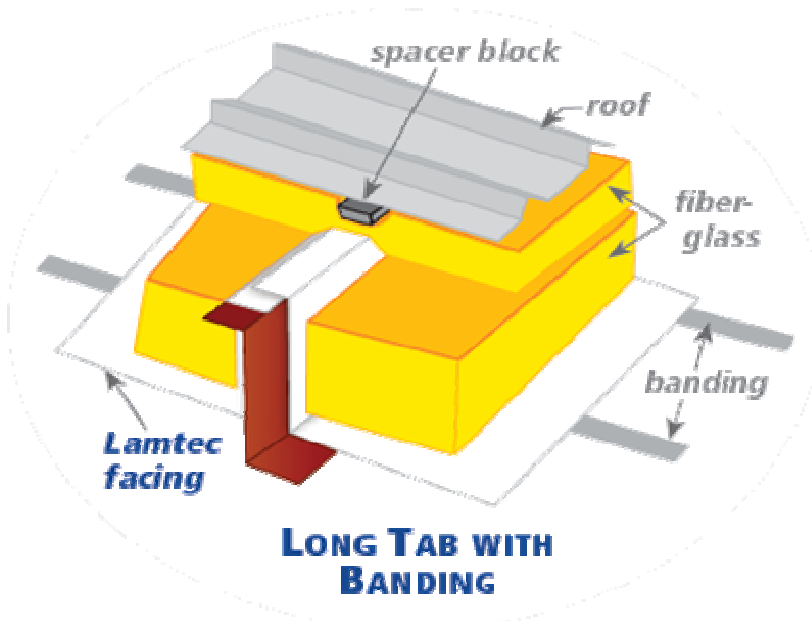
Cutaway of roof assembly (courtesy of Lamtec).
